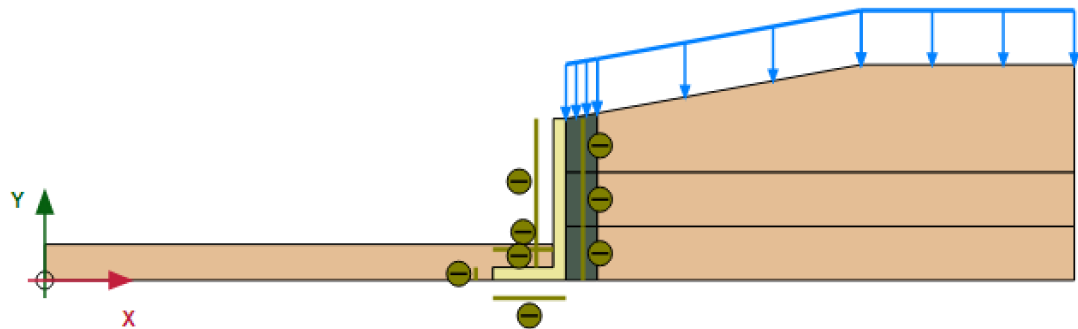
Retaining wall with backfill slope 10° and 0.9m TDA backfill
